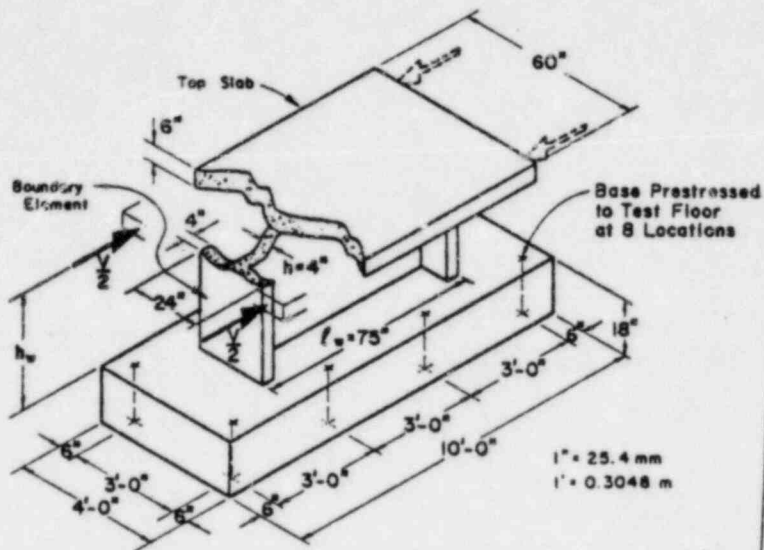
Setup for Tests of "Low Rise" Walls (1)
